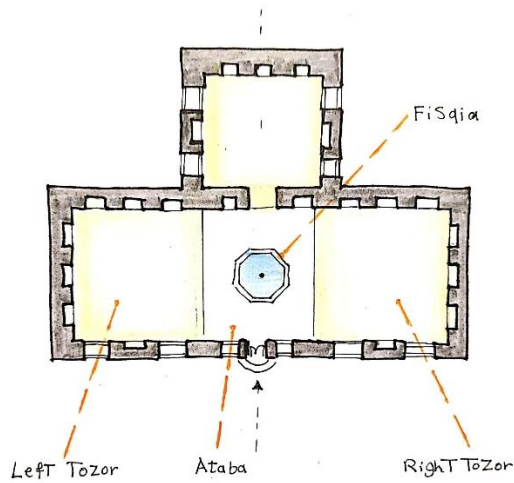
A Plan of Qa'a at Mardam Biek House sketched by Author.
